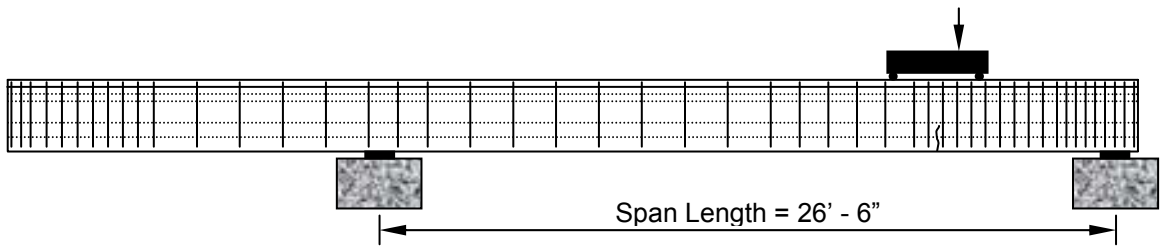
Crack Pattern at Cracking Load for STD-M-2W
